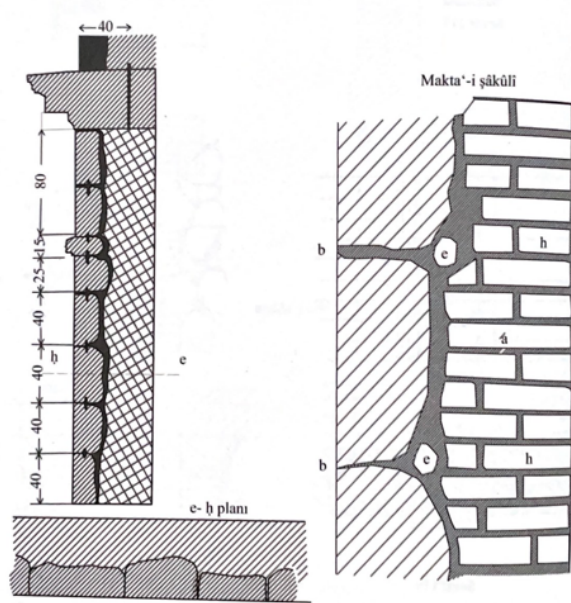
The section drawings of the brick masonry wall with stone cladding applied in 19<sup>th</sup> century (Ali Talat, 2022)
